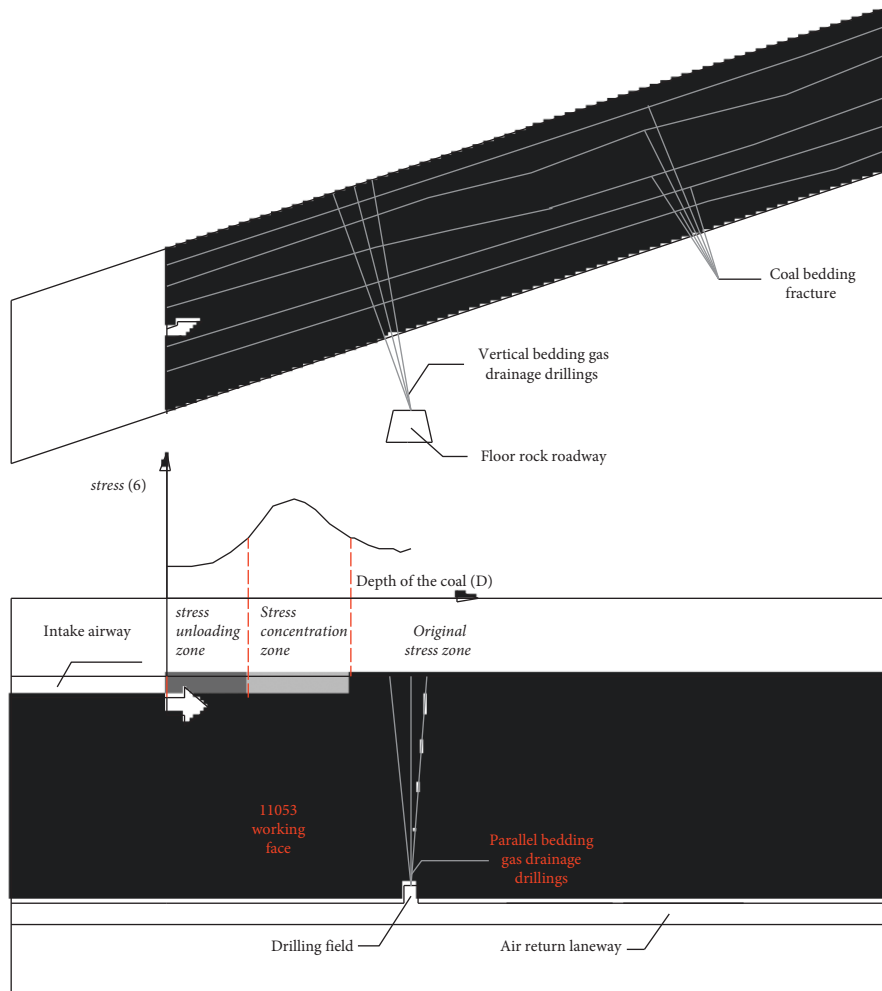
Gas drainage drillings layout along and through layers layout in 11,053 working face.
